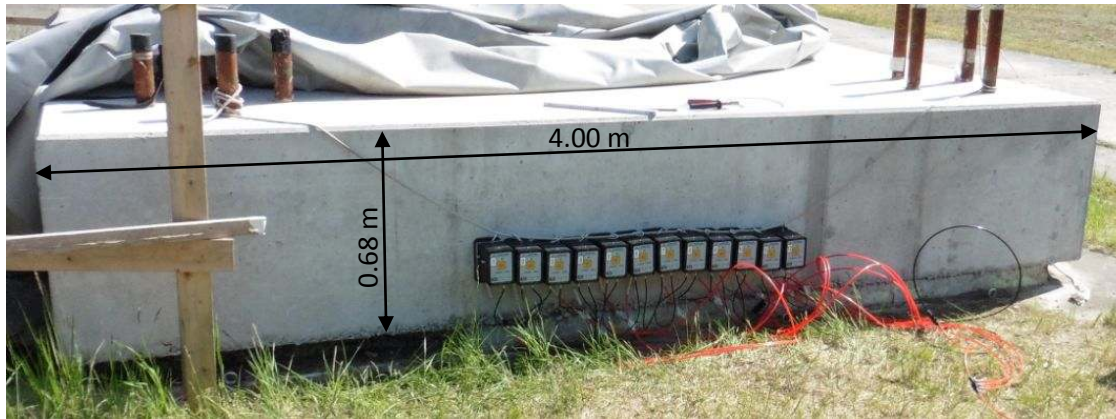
LAUS mounted at foundation slab imaging the back wall echo (4 m) and internal reflectors as presented in figure 7
